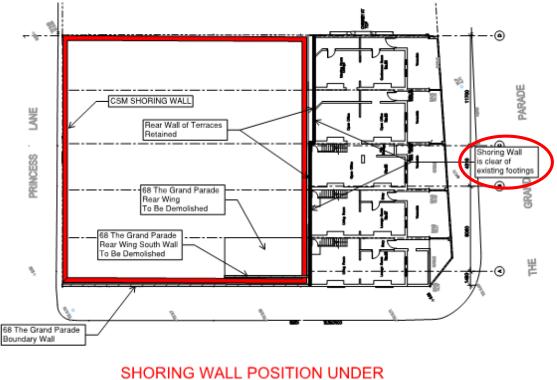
Location of proposed shoring wall (Source: Structural Design Solutions, Attachment 4)
